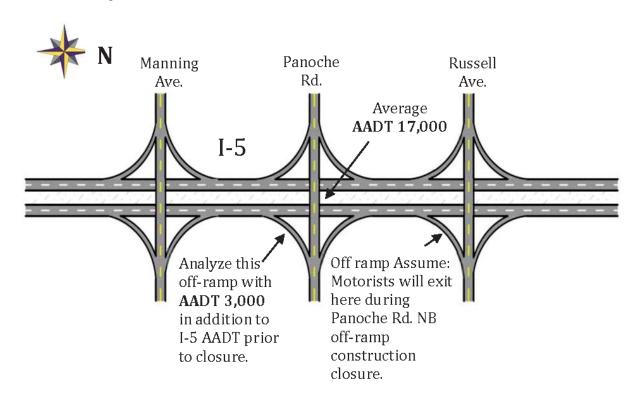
Layout showing AADT for I-5 and for off-ramp (pre-construction)
